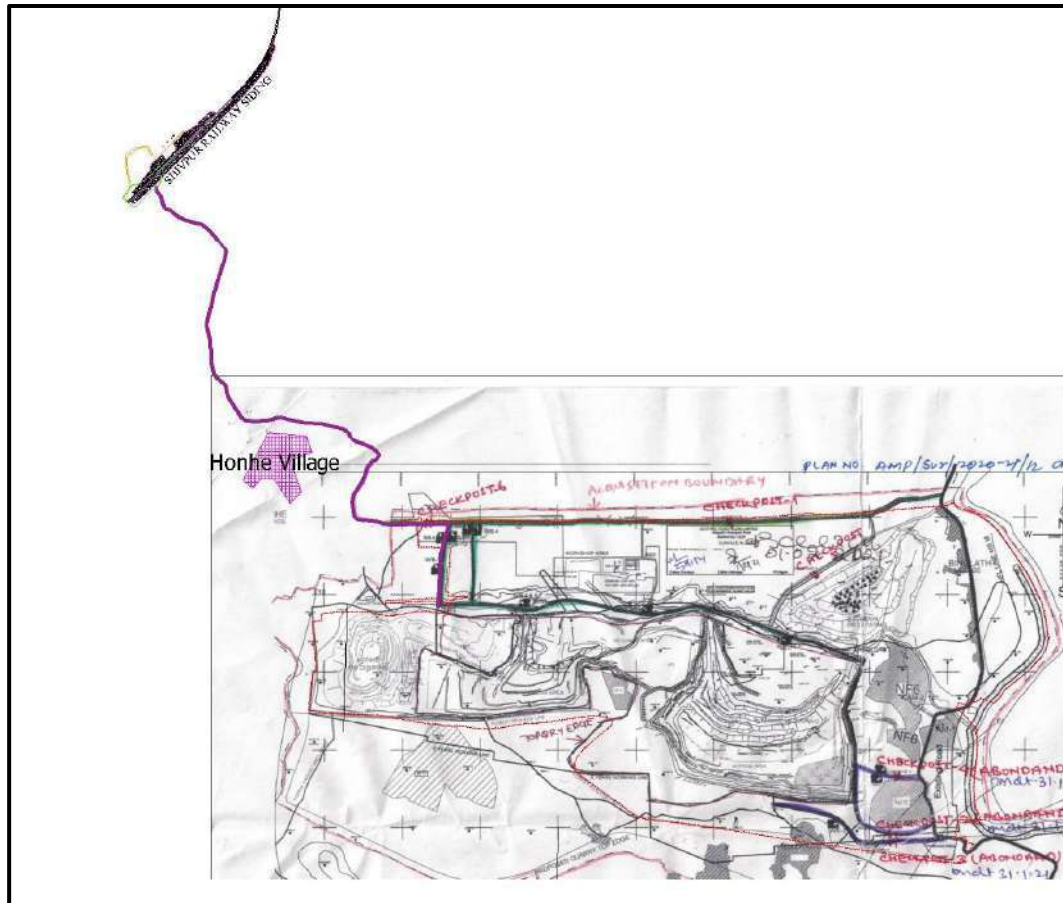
Plan Showing Coal Transportation Road Adjacent to Honhe Village
